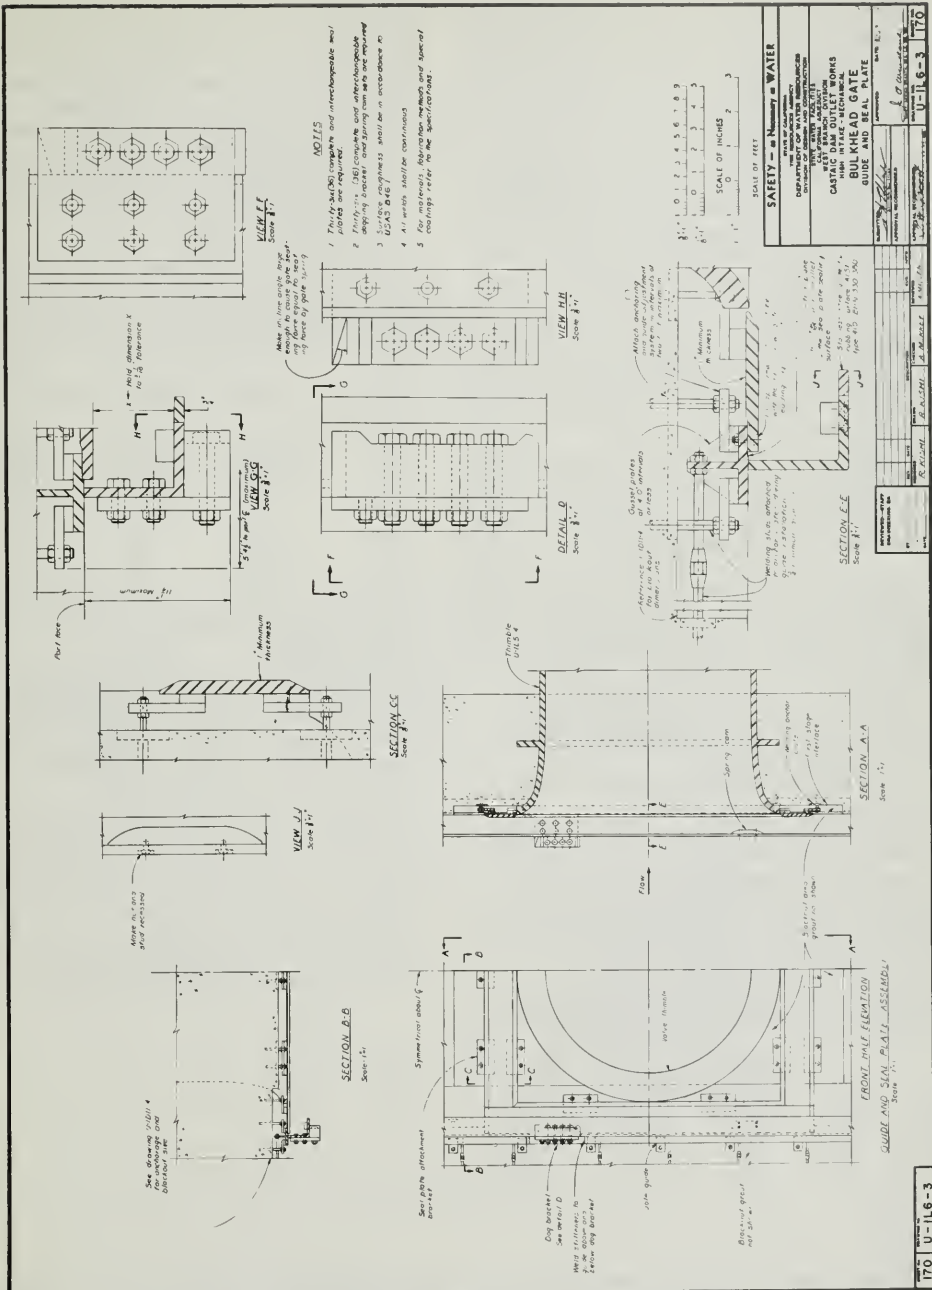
General Arrangement of Bulkhead Gate, Thimble Seal Plate, and Guide
